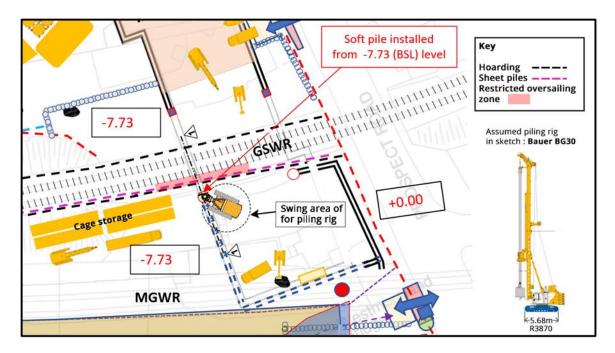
Plan View of Distance Between Piling Rig and Operating GSWR Railway
